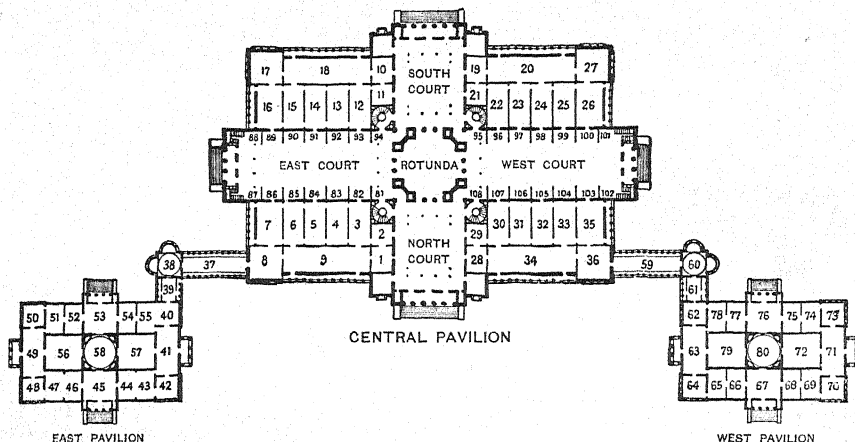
Field Columbian Museum. Plan of ground floor.
